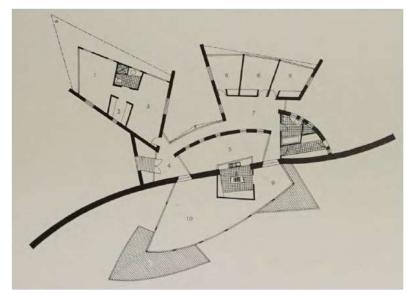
A floor plan of the Choong House. The numbers designate the following: 1 Master bedroom; 2 Dressing room; 3 Study; 4 Entry; 5 Courtyard; 6 Bedrooms; 7 Play area for children; 8 Kitchen; 9 Dining area; and 10 Living area. (Source: Jahn 1996:171)
